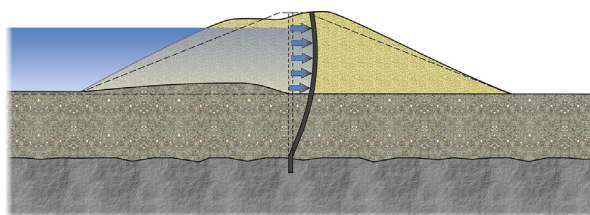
Schematic overview of cut-off wall deformation after dam consolidation and reservoir fluctuation, as well as original state (dashed lines).
